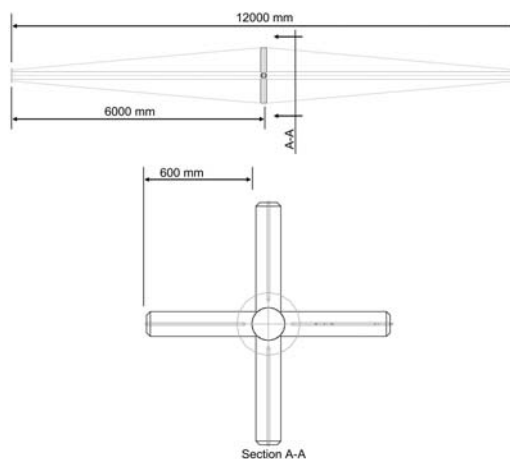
Stayed carbon steel columns layout and dimensions (Araujo et al. 2008).
